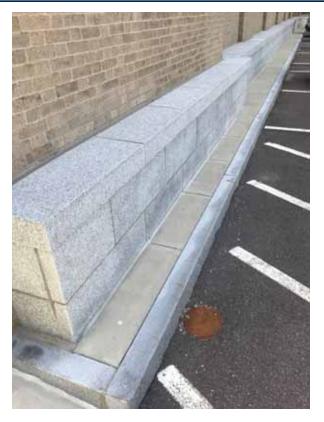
West exterior wall granite base course (appears to be of newer construction)
